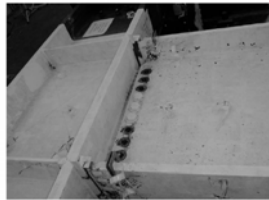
Bolts failure at 3% drift cycle in Specimen EC03
